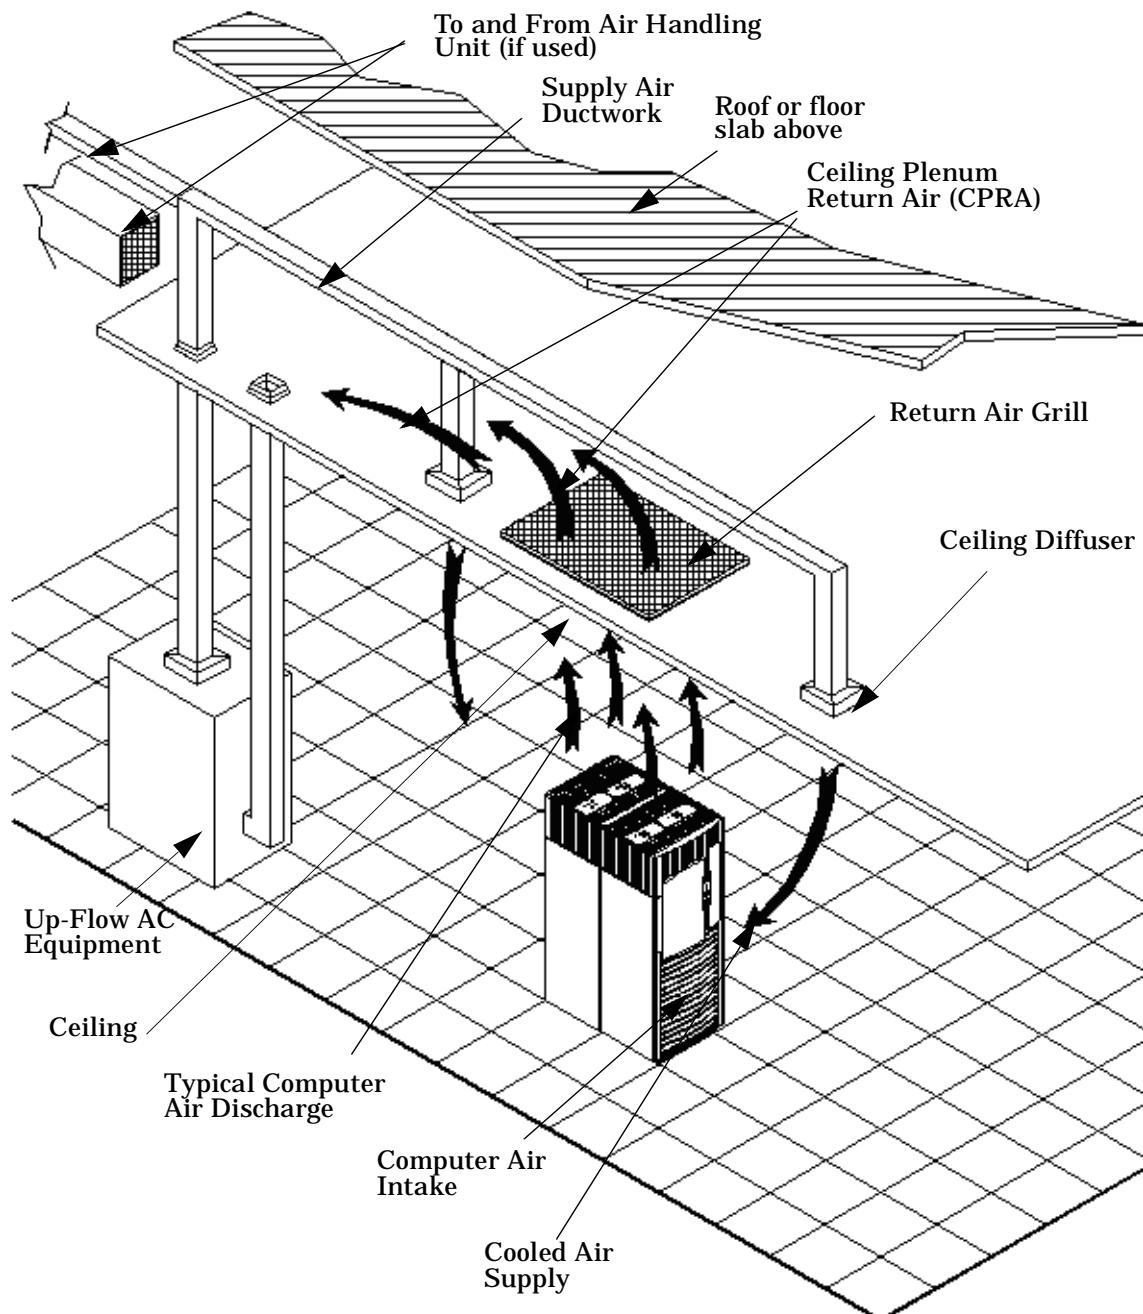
Typical Computer Room Raised Floor Layout
